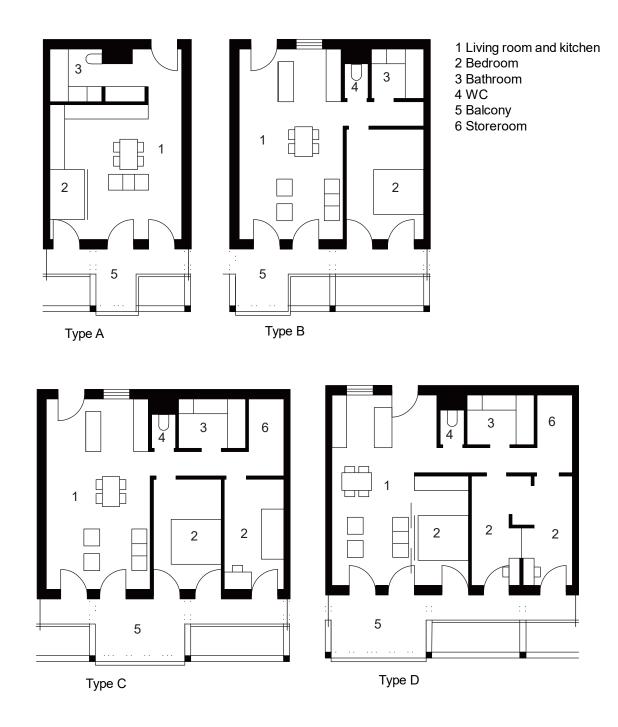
SMART apartments in Sonnwendgasse 29+31 floor plans of the Smart apartments in object C.04 West. Source: Geiswinkler & Geiswinkler Architekten. http://geiswinkler-geiswinkler.com/aktuelles.html
